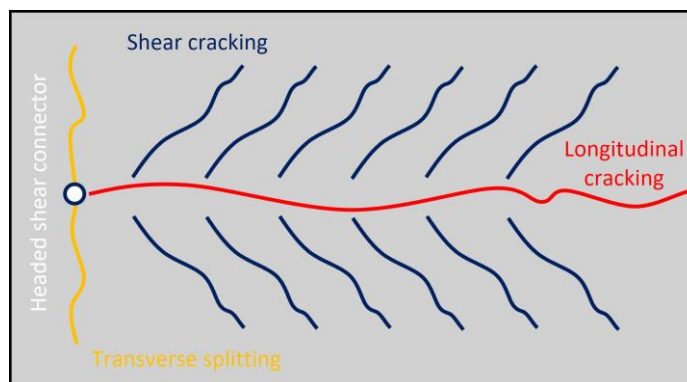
Top view of a concrete slab and possible failure modes.
